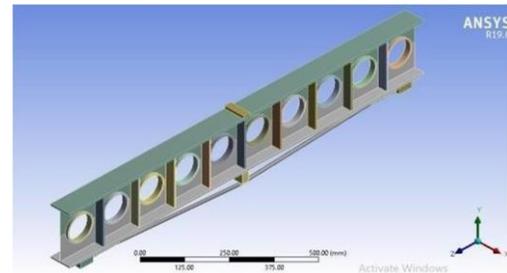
Strengthening with LPT, ring stiffeners and vertical stiffeners
